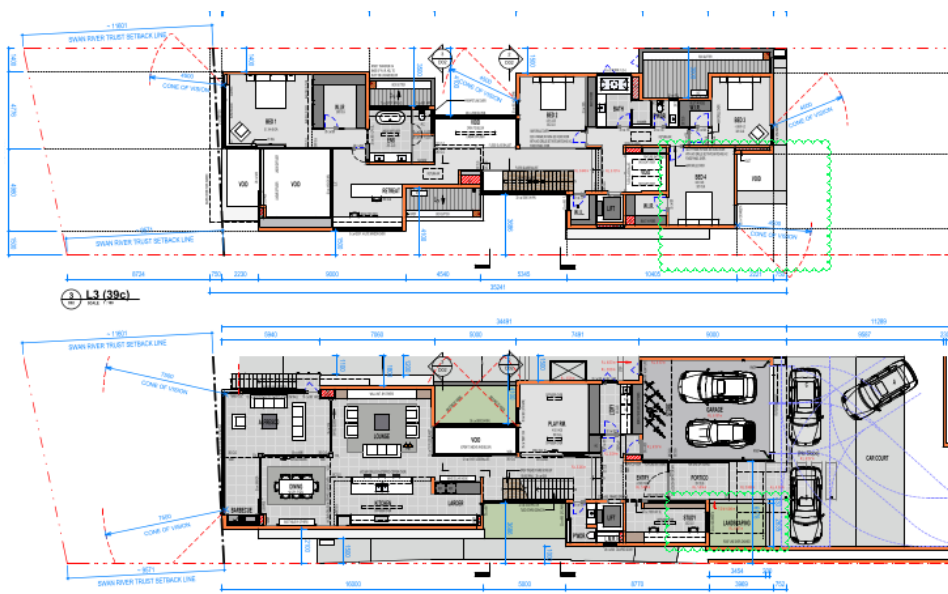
Ground floor and first floor of the approved development at 40B Fraser. Areas highlighted in green will have a view of the proposed development
